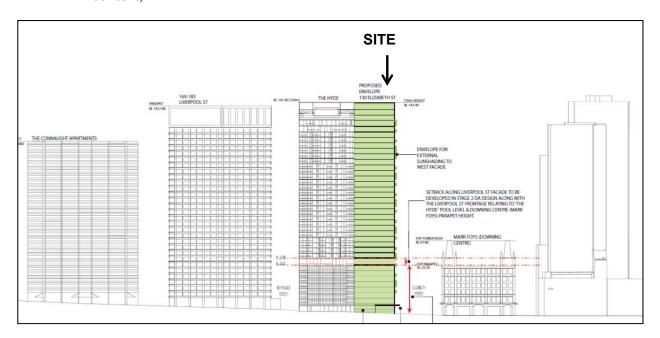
The proposed building envelope in its Liverpool Street context, noting that these buildings do not contain a street frontage height/podium
